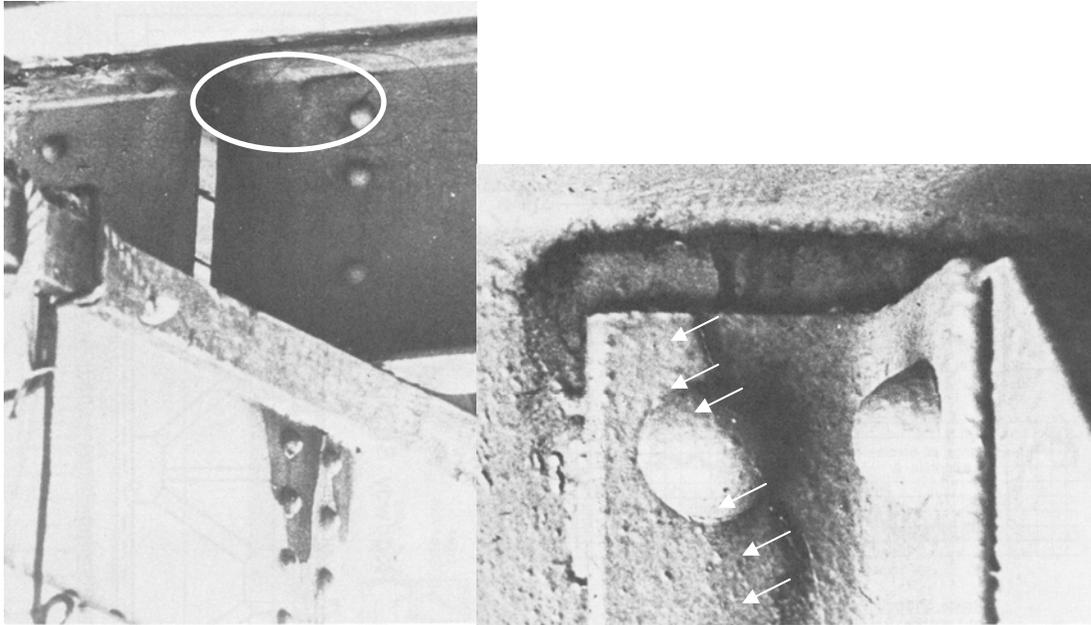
Stringer web cracks above bracket at roadway relief joint of the Walt Whitman Suspension Bridge
